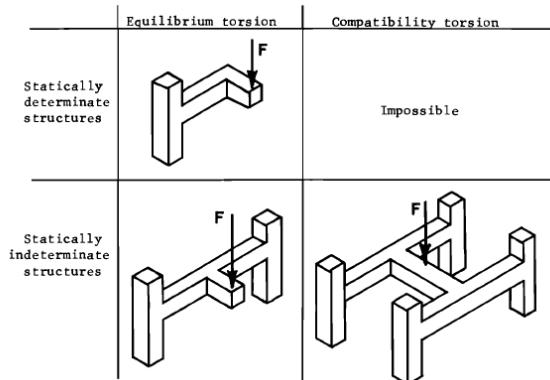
Equilibrium and Compatibility Torsion (Rameriz and Breen, 1983)
